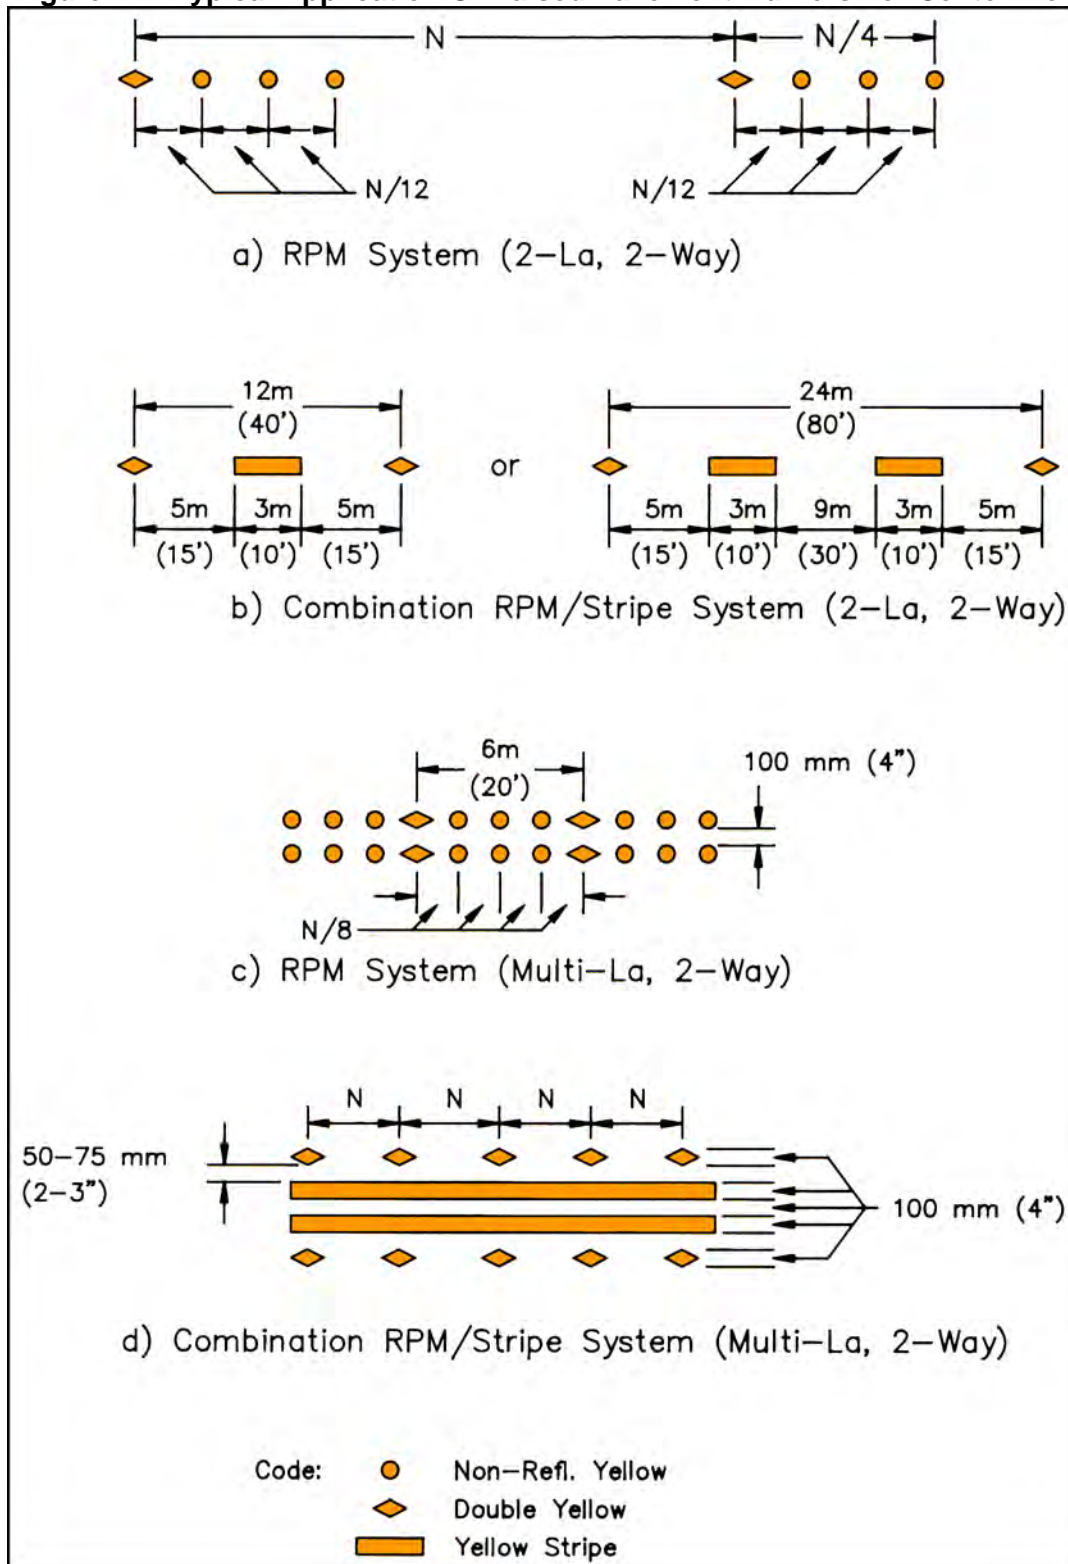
illustrates typical applications of raised pavement markers for centerline. A summary of the characteristics of pavement marking materials is shown in Table 7-1.
